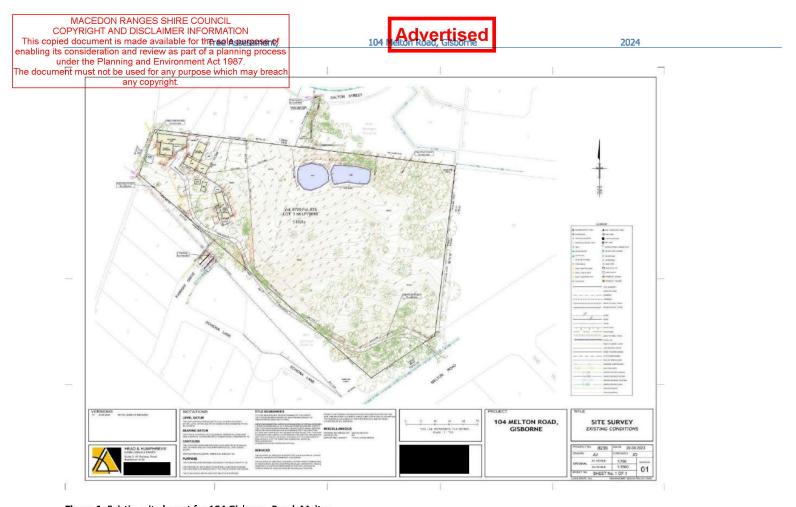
Existing site layout for 104 Gisborne Road, Melton.
